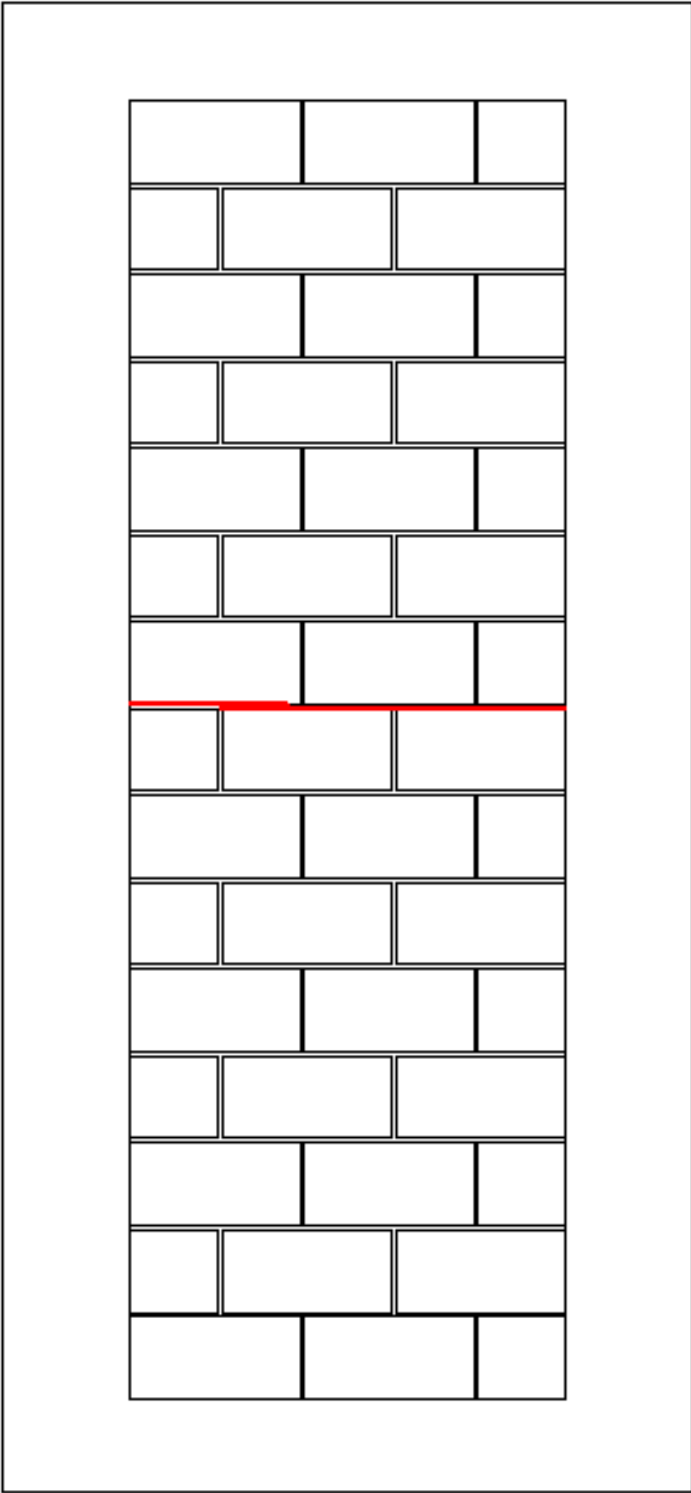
Cracking Pattern of Unreinforced 3m Control Wall
